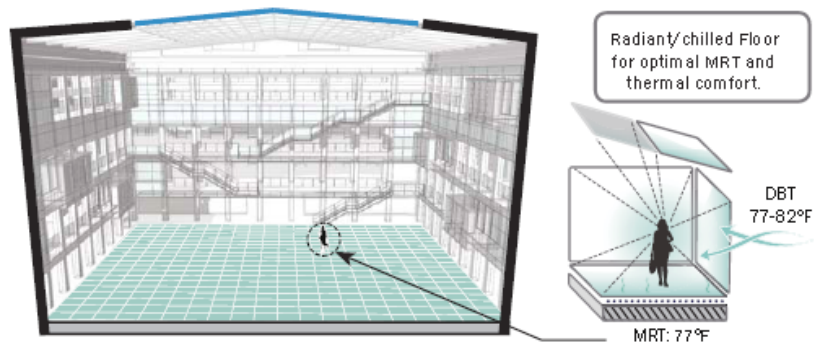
OPTION 4 - RADIANT FLOOR COOLING + THERMAL MASS [SHGC: 0.25][8" CONCRETE FLOOR]
